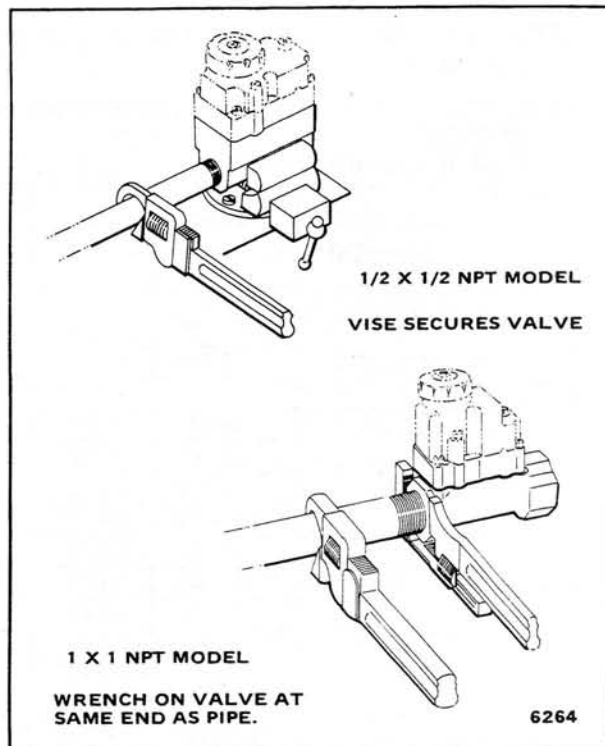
SECURE VALVE WHEN CONNECTING PIPE.
